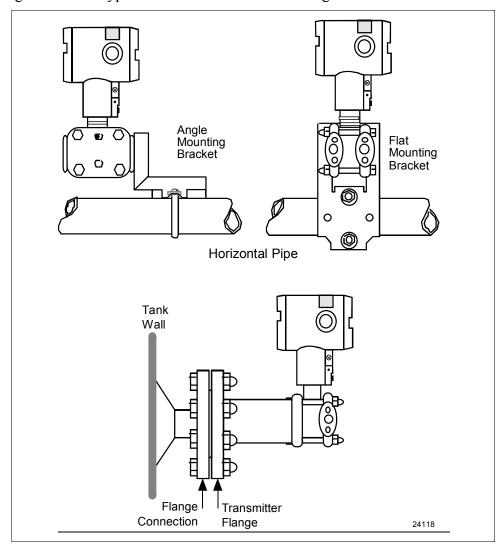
Typical Bracket Mounted and Flange Mounted Installations
